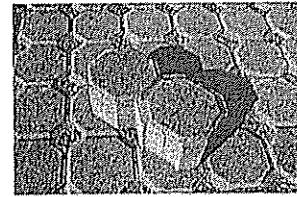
Interlocking pavers can allow water through openings created by the paver shape.
